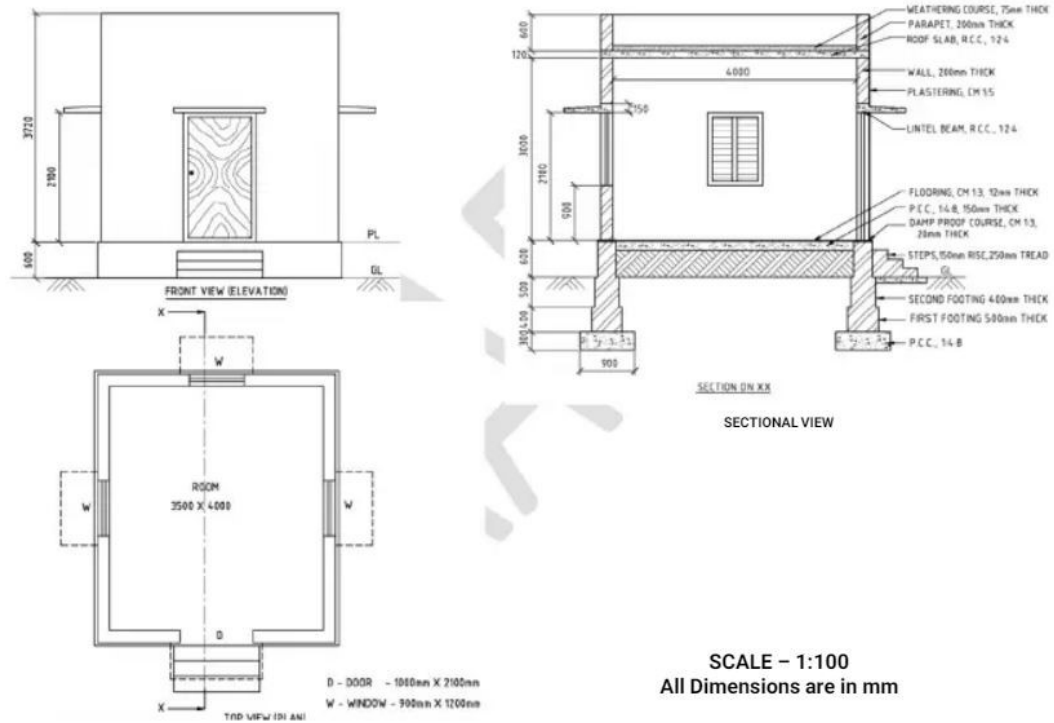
Plan, Elevation and Sectional view of a single storey building with single room
